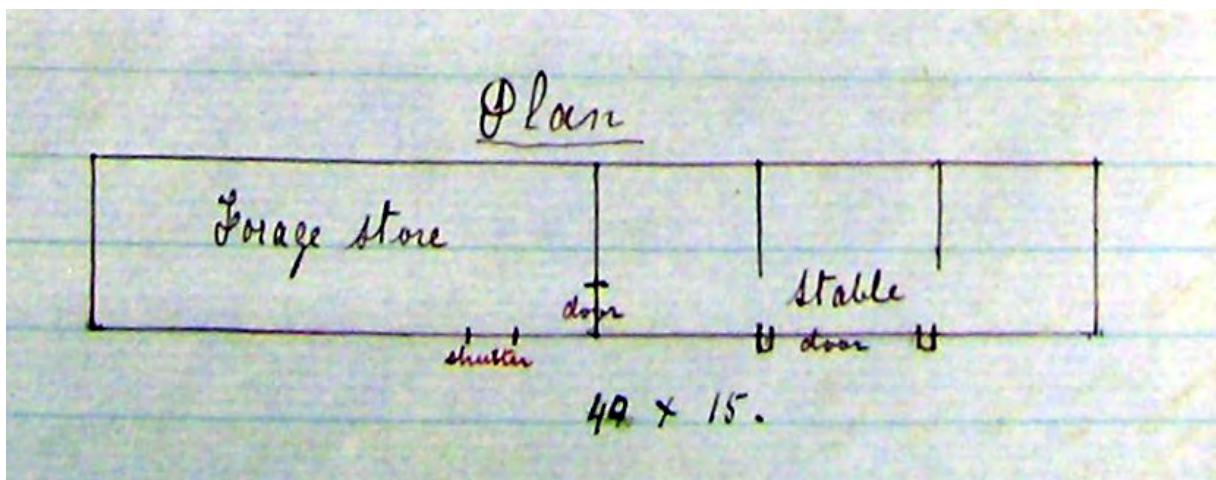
H.J. Runting, Plan of Proposed Police Stables & Forage Store, Blackwood, March 1876.
